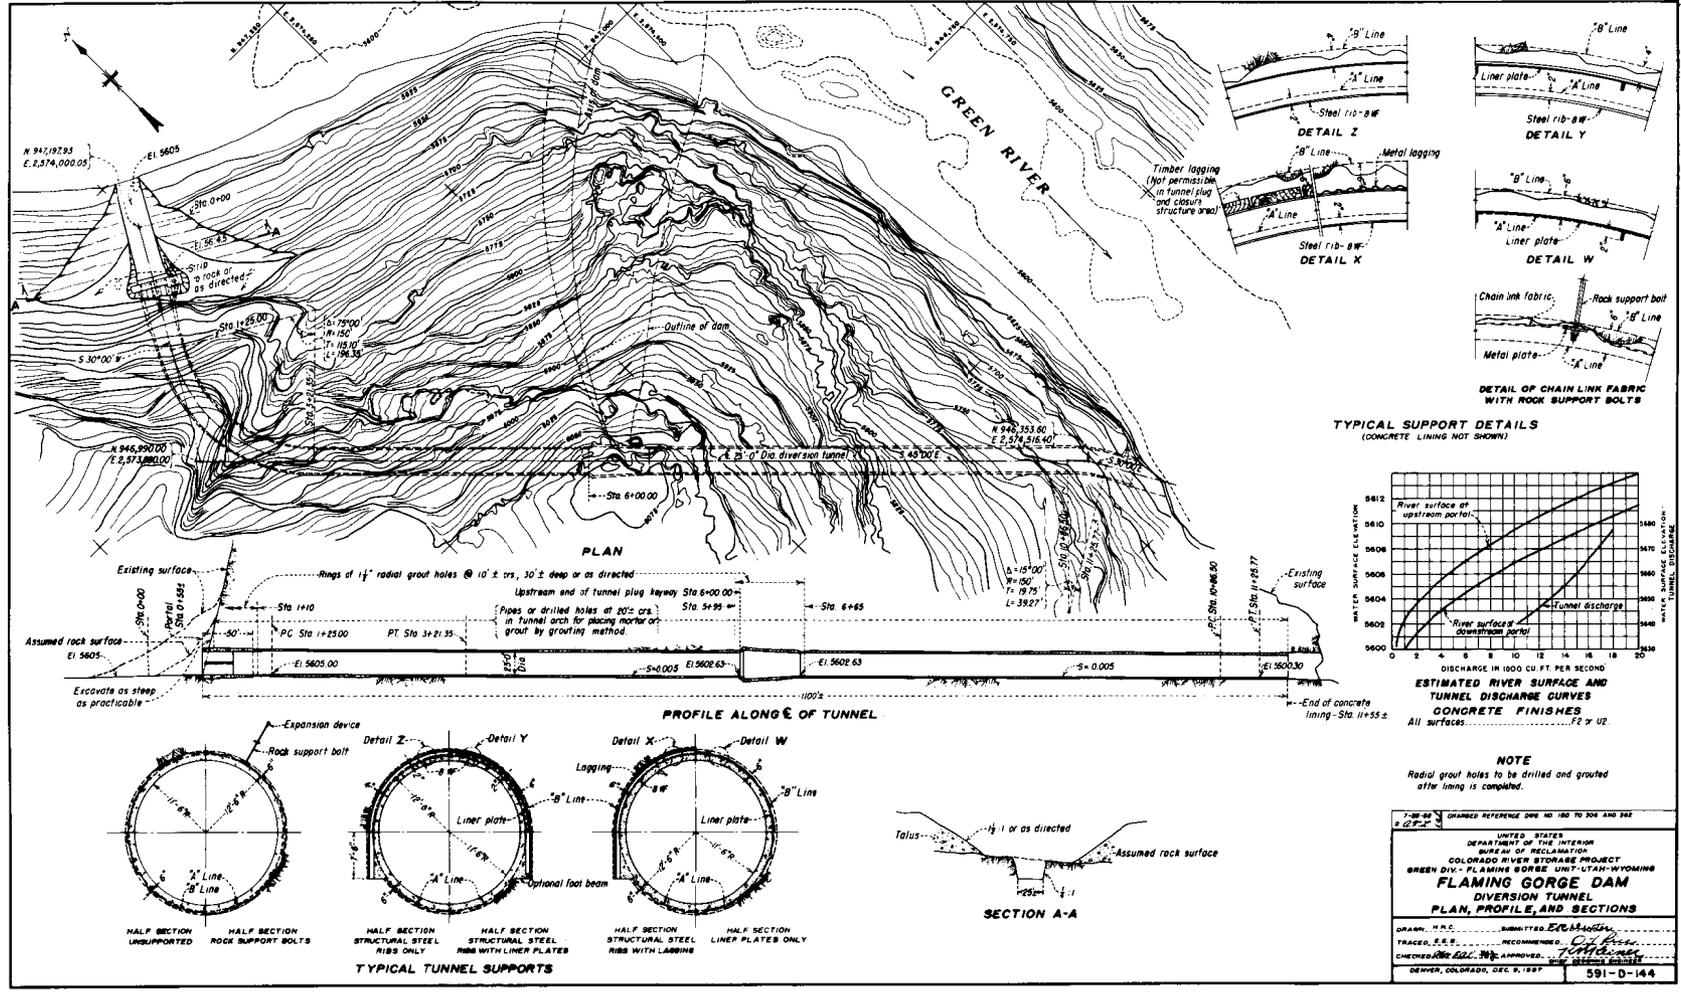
Diversion tunnel for Flaming Gorge Dam, a large concrete dam in Utah—plan, profile, and sections.
